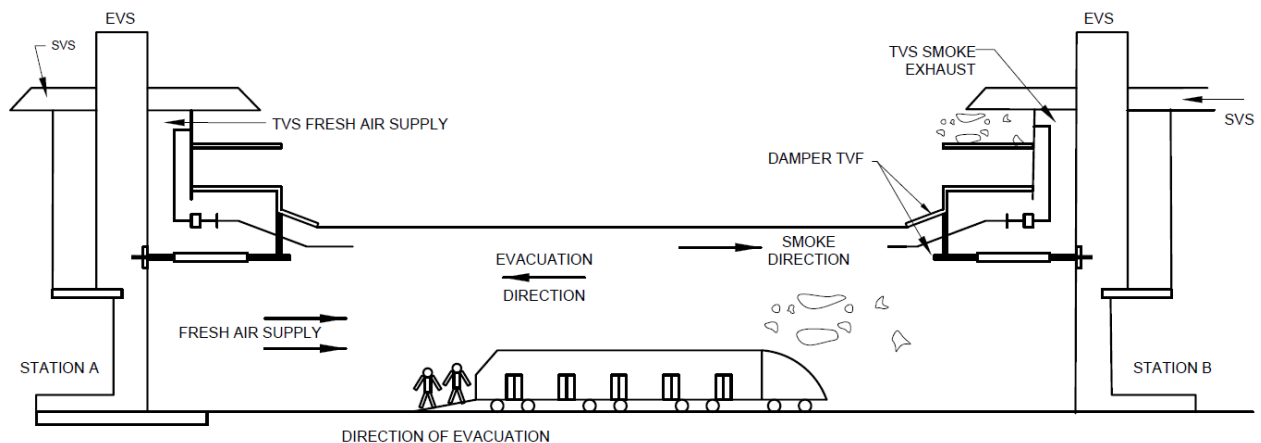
VENTILATION IN TUNNEL DURING FIRE ON A TRAIN
